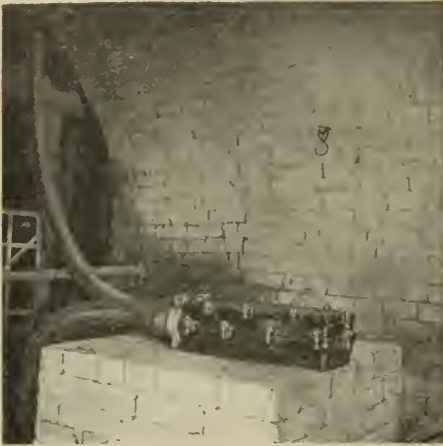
SINGLE-ENDED TYPE OF HORIZONTAL JOINT-BOX (FOR FIXING IN AN INSET) TO CONNECT UP SHAFT CABLES.
